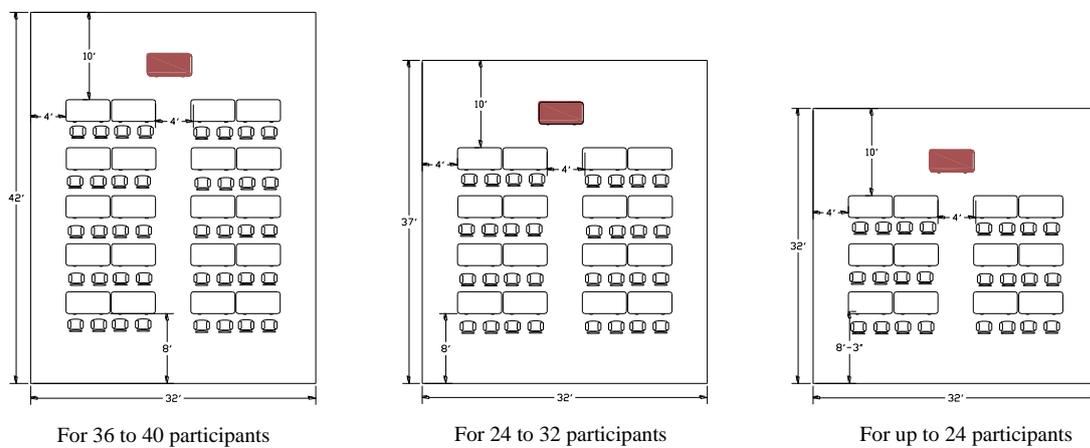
CLASS ROOM SITTING ARRANGEMENT
